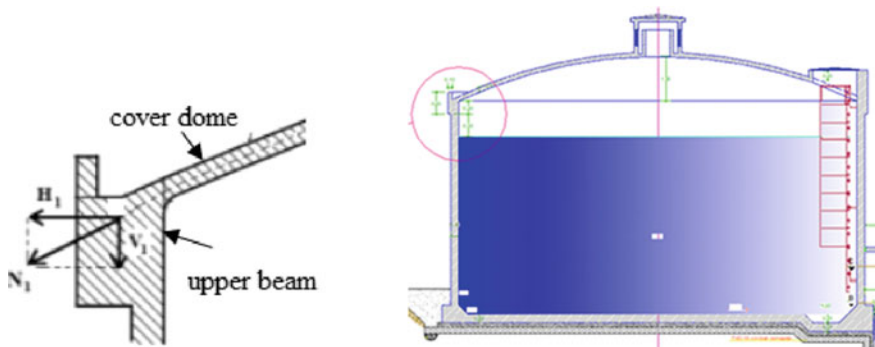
Cross-section of the tank placed on ground and the upper beam
